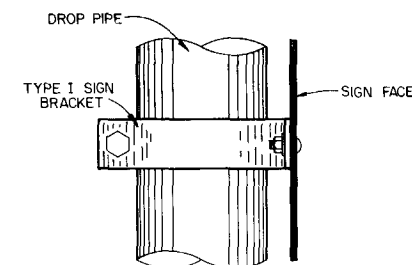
DETAIL / OPPOSING SIGNS SPAN WIRE MOUNTED
